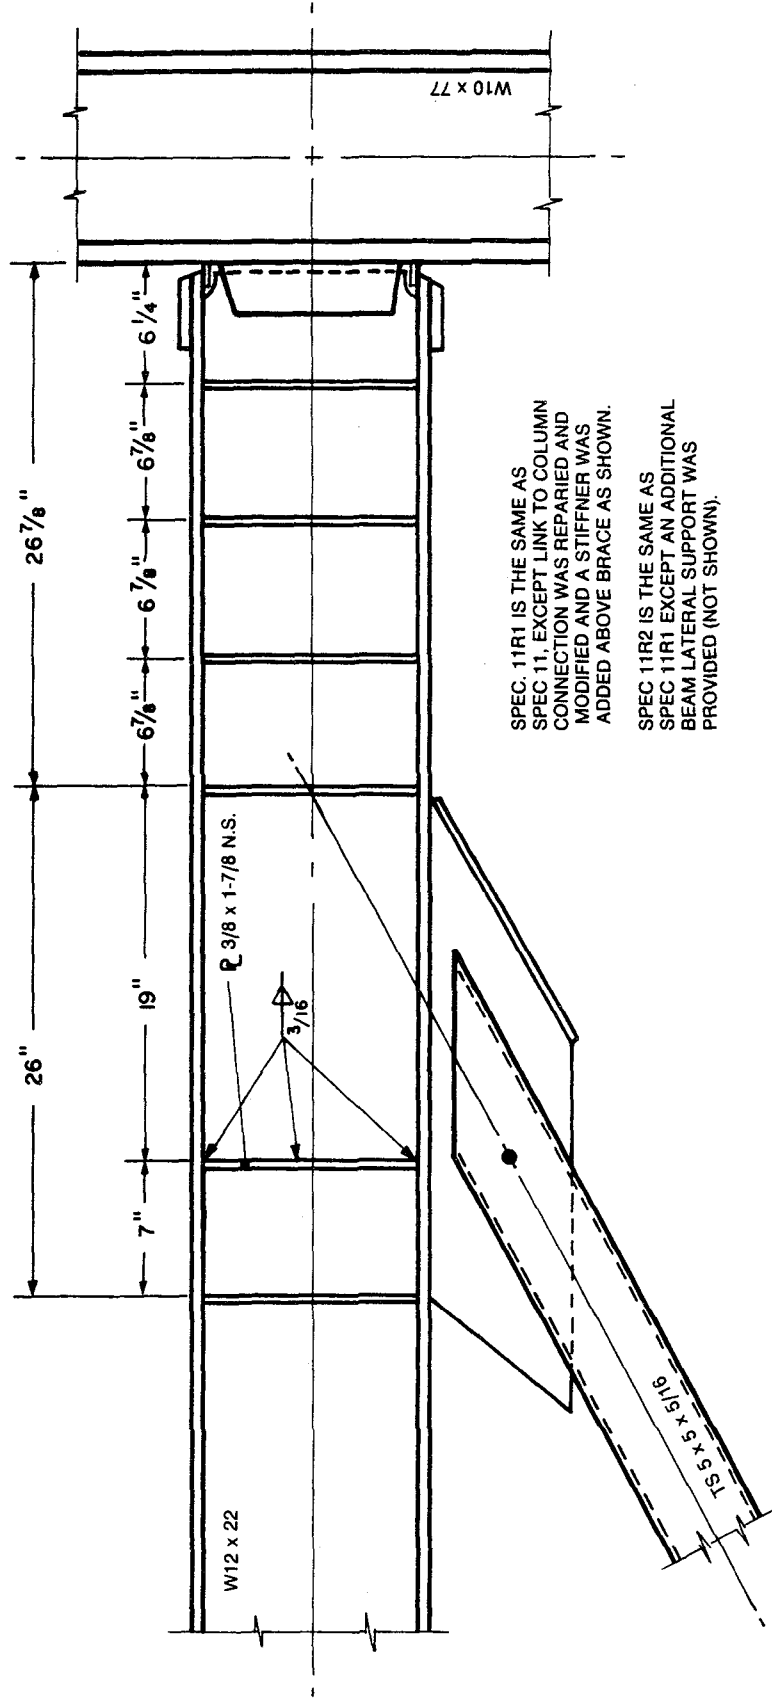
Link Details - Specimens 11R1 and 11R2
